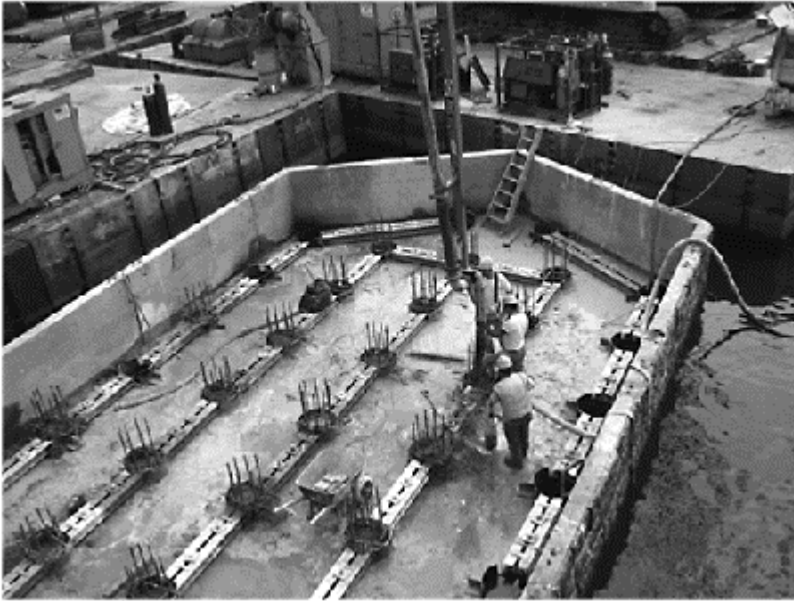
Work being performed inside a cofferdam. Piles are being filled with concrete. Structural support of the cofferdam has been transferred to the heads of the piles.
